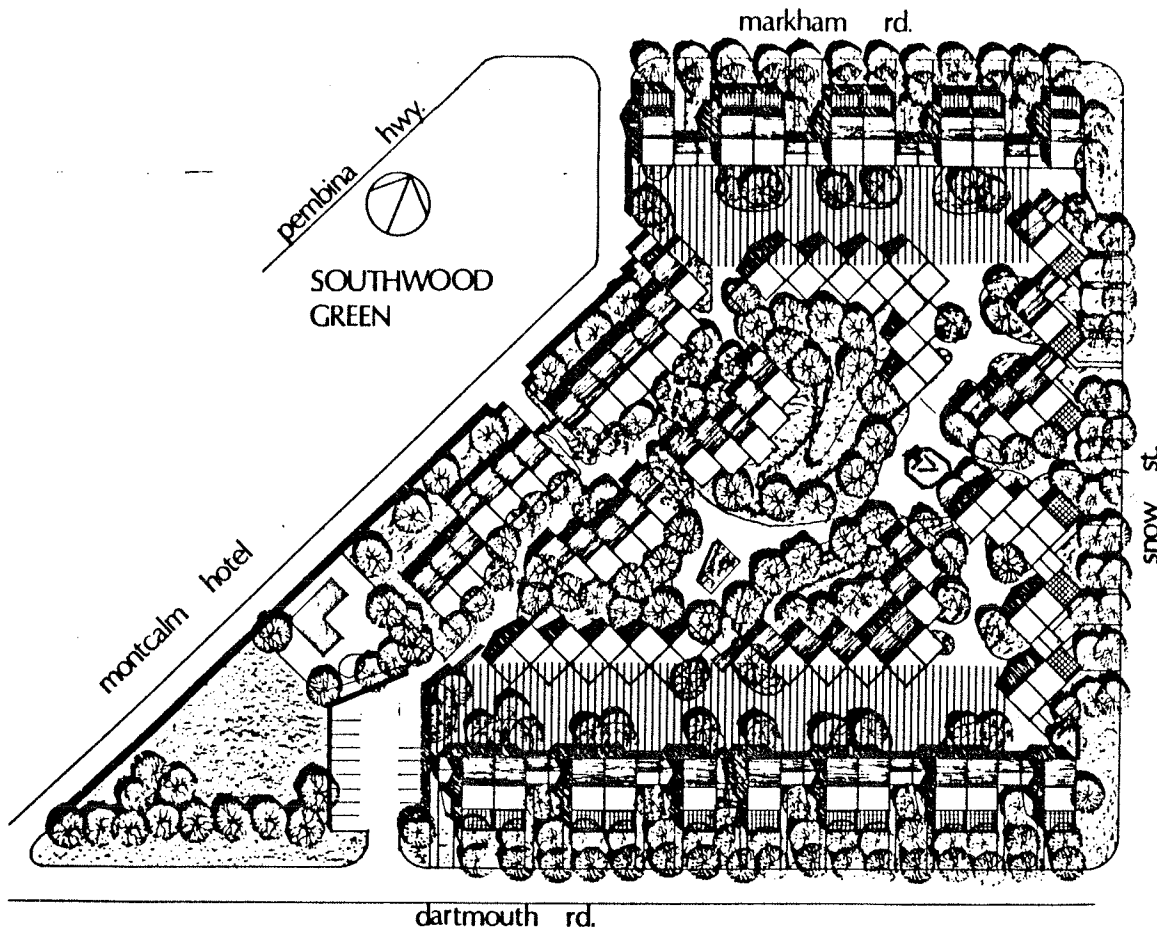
Plan of Southwood Green Condominiums, 19 Snow Street (From Simon, 1982.)
